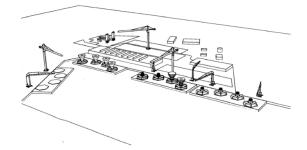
Diagram of fabrication and construction plant for concrete gravity foundations in Swinoujscie, Poland.¹¹³
